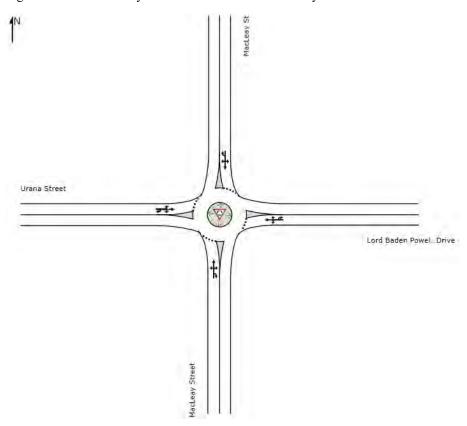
Urana Street/MacLeay Street SIDRA intersection layout
